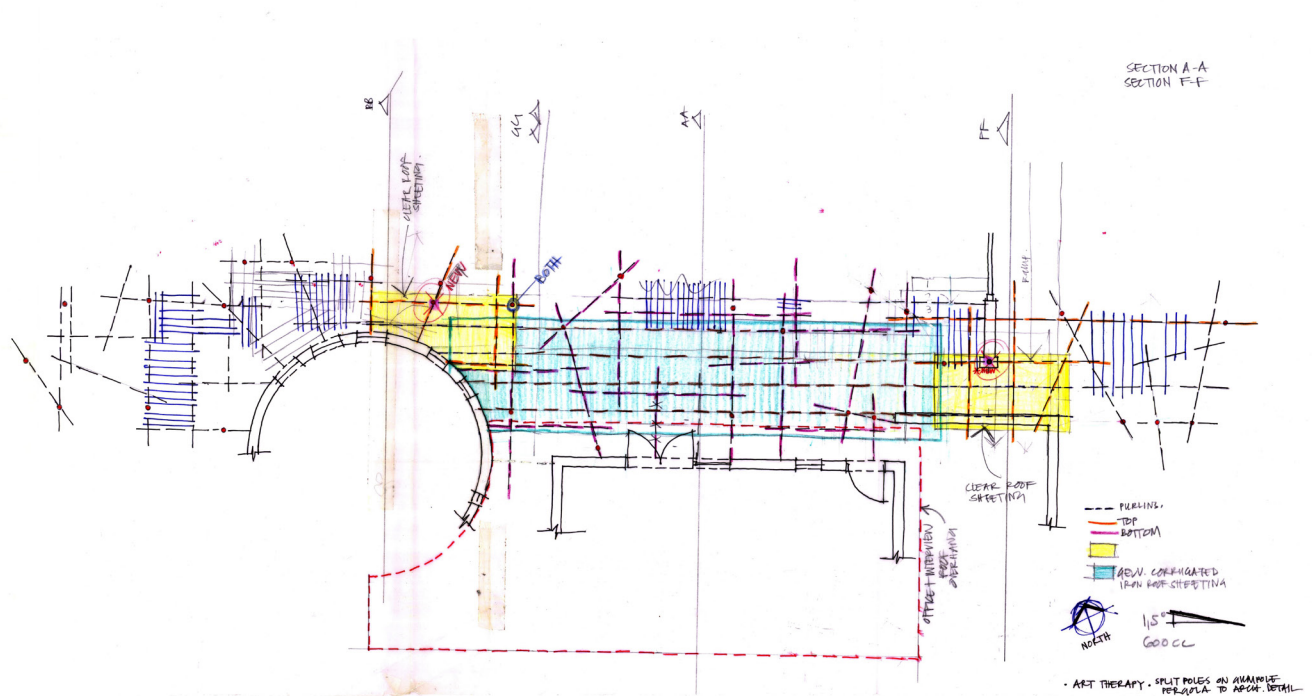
Otten, K. 'Concept plan & structural layout'. Johannesburg, 2002 (www.wolffarchitects.co.za)
